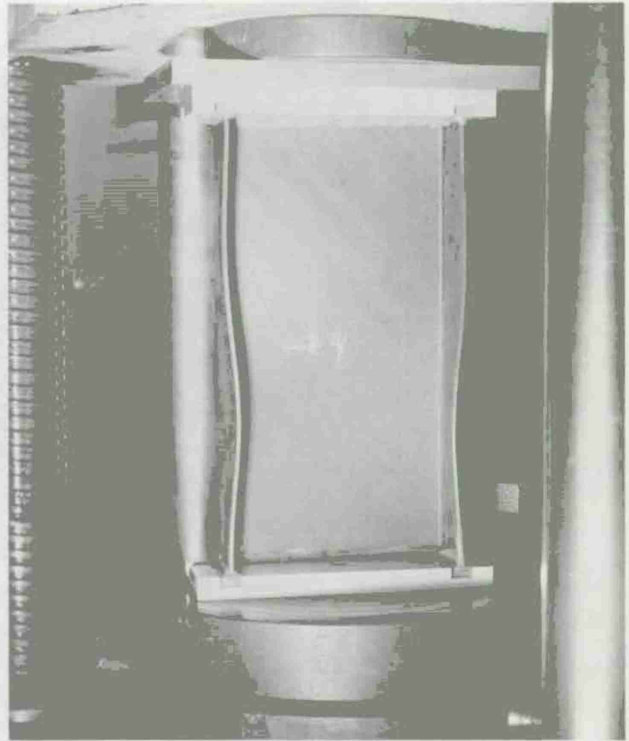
Compressive post buckling of channel specimen 24-1 at 19,100-lb load.
